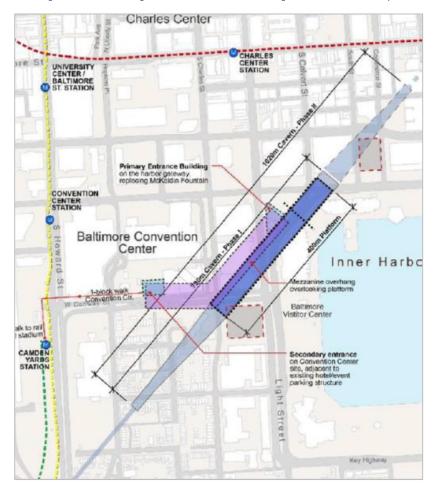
Calvert / Light Street SCMAGLEV Underground Station Concept
